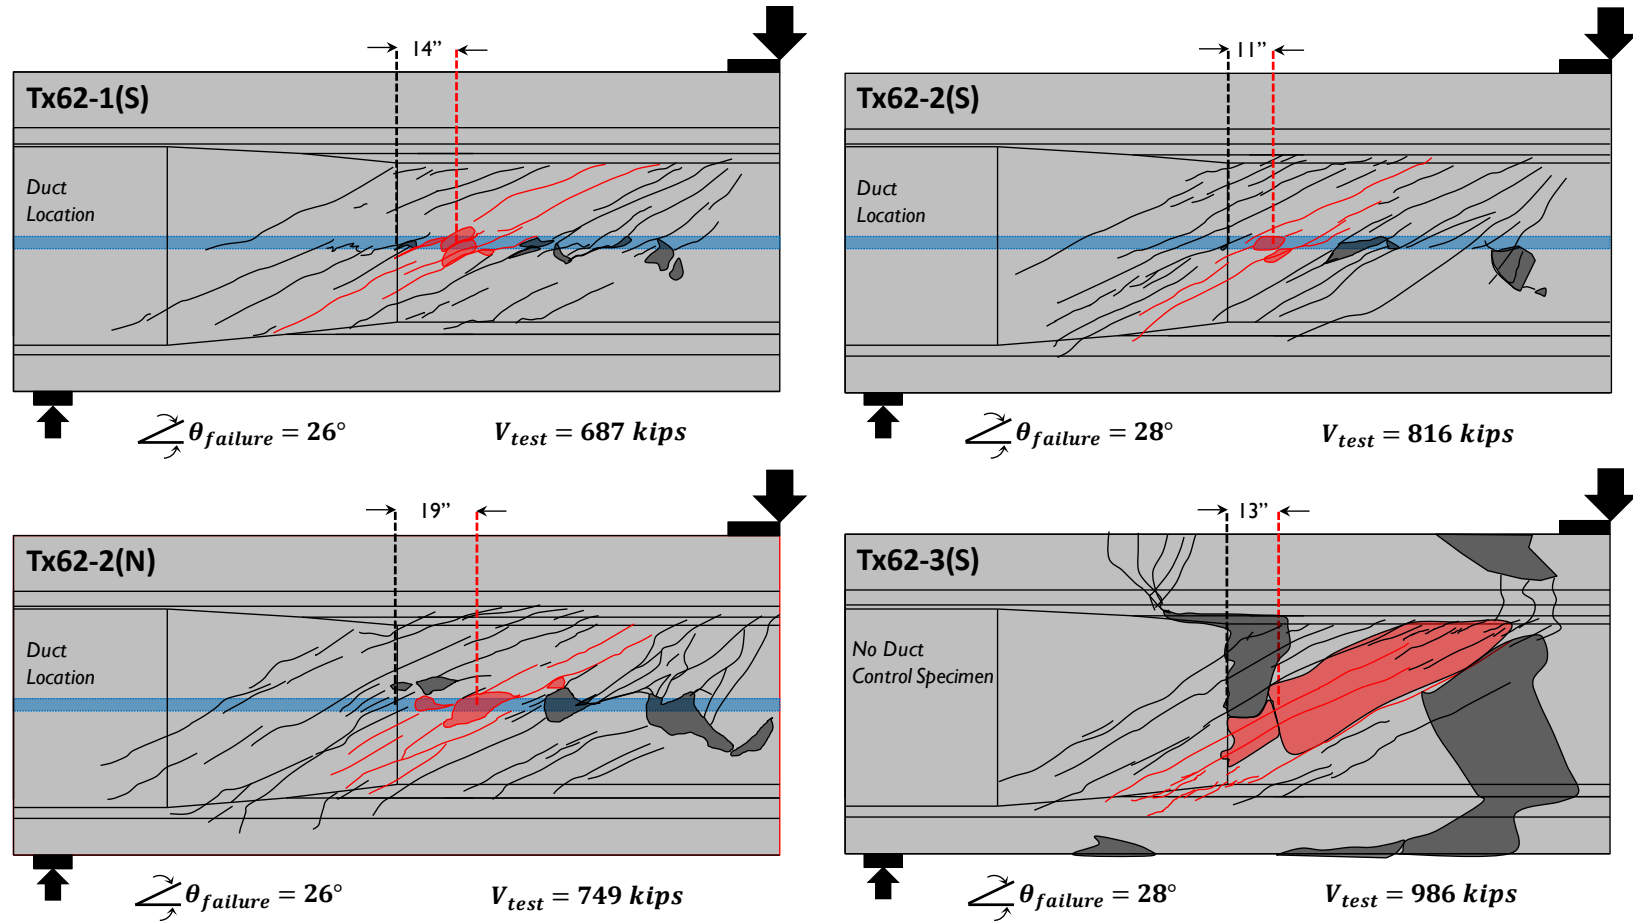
Failure Mechanisms of Test Specimens Primary Failure Cracks in Red (Part 1 of 3)
